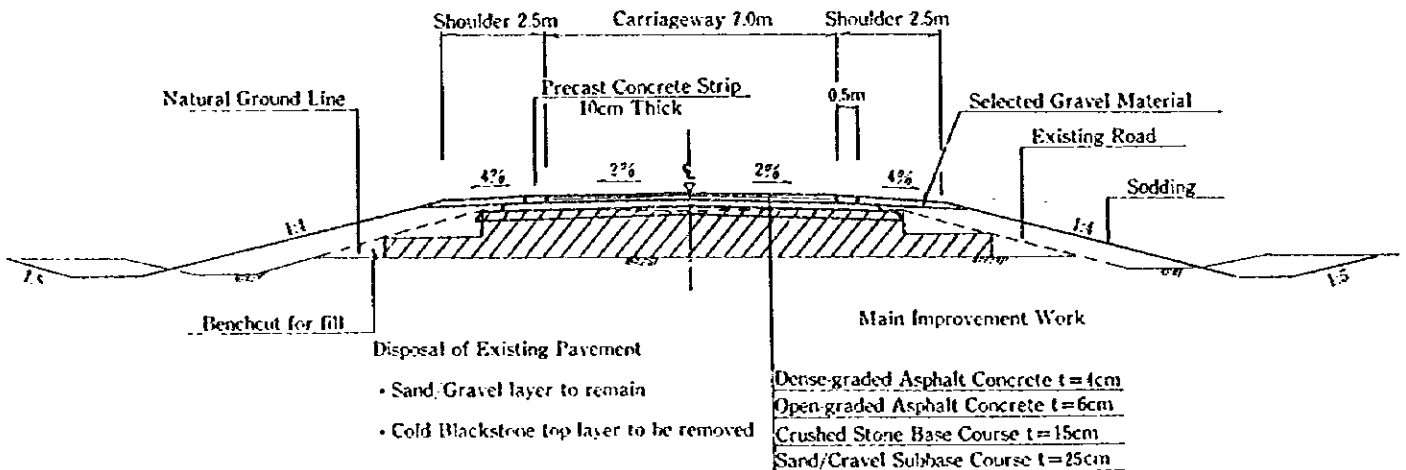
(3) : Cross-Section of Road for Type-III-1 Improvement
